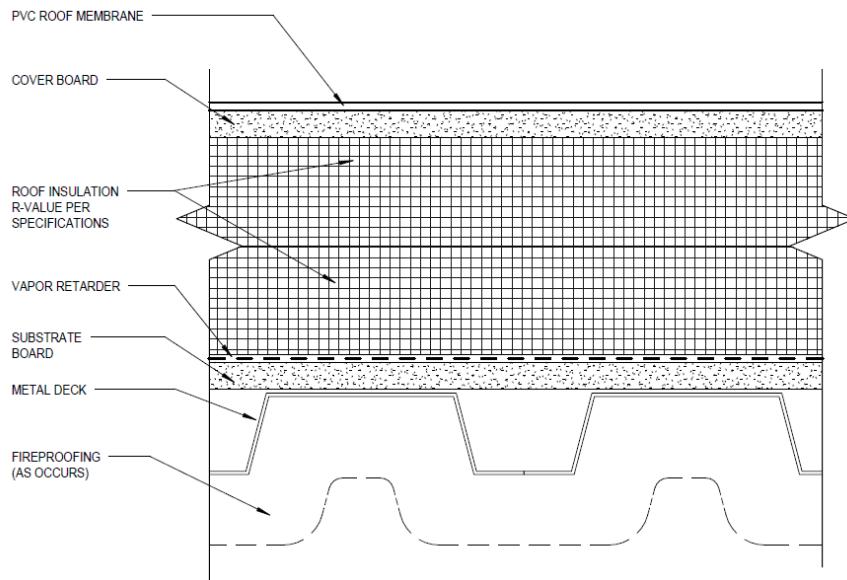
| Penthouse Roof Section (SmithGroupJJR)
